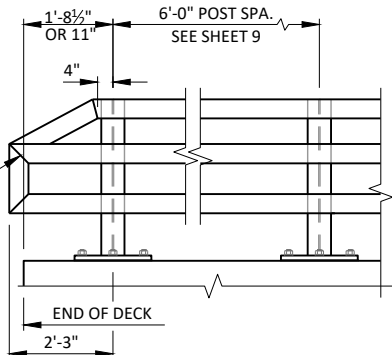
DETAIL AT END POST (THRIE BEAM RAIL ATTACHMENT)
